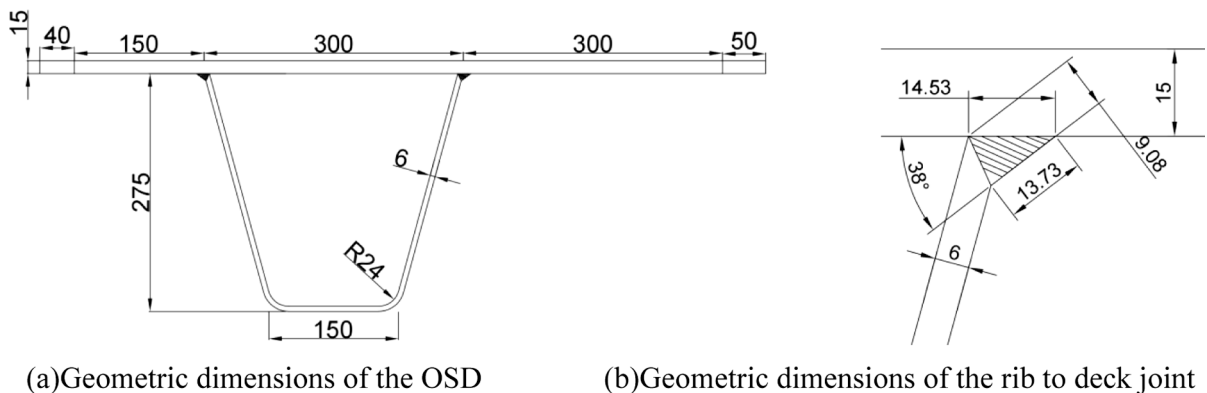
Geometric dimension of the specimen [18]. (a)Geometric dimensions of the OSD (b)Geometric dimensions of the rib to deck joint.
